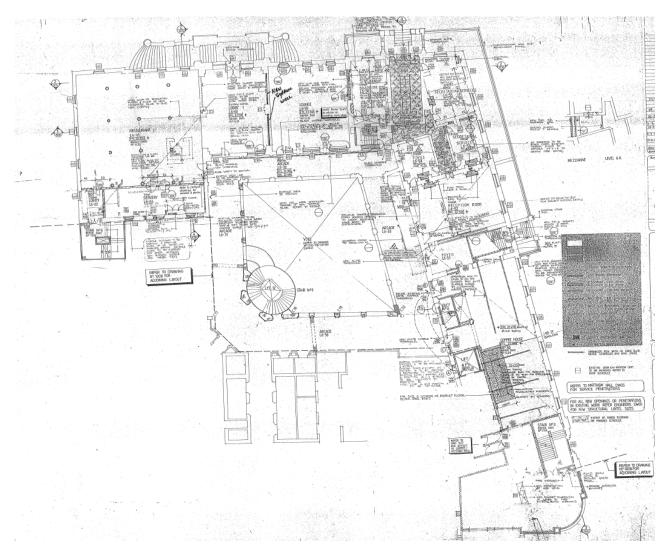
Extract proposed plans from 1983: Ground Floor (Treasury section)
